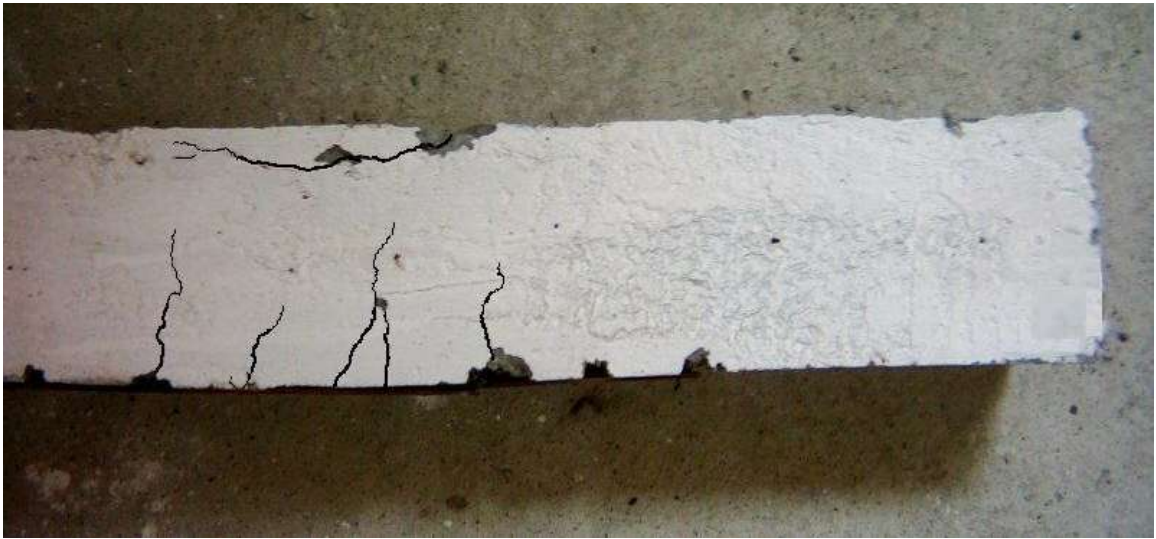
Crack pattern of beam showing flexural failure at ultimate load
